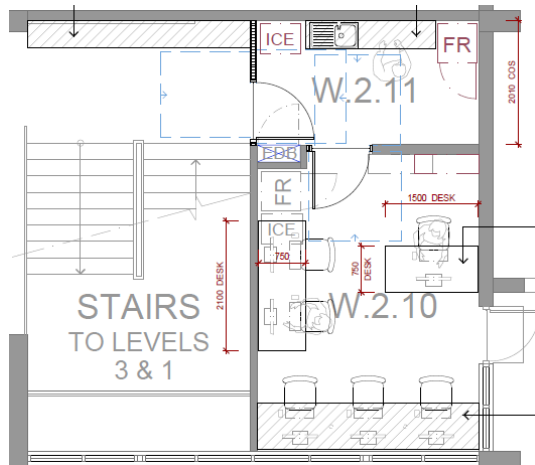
upgrade to staff room, Building W (source: JPA&D)
